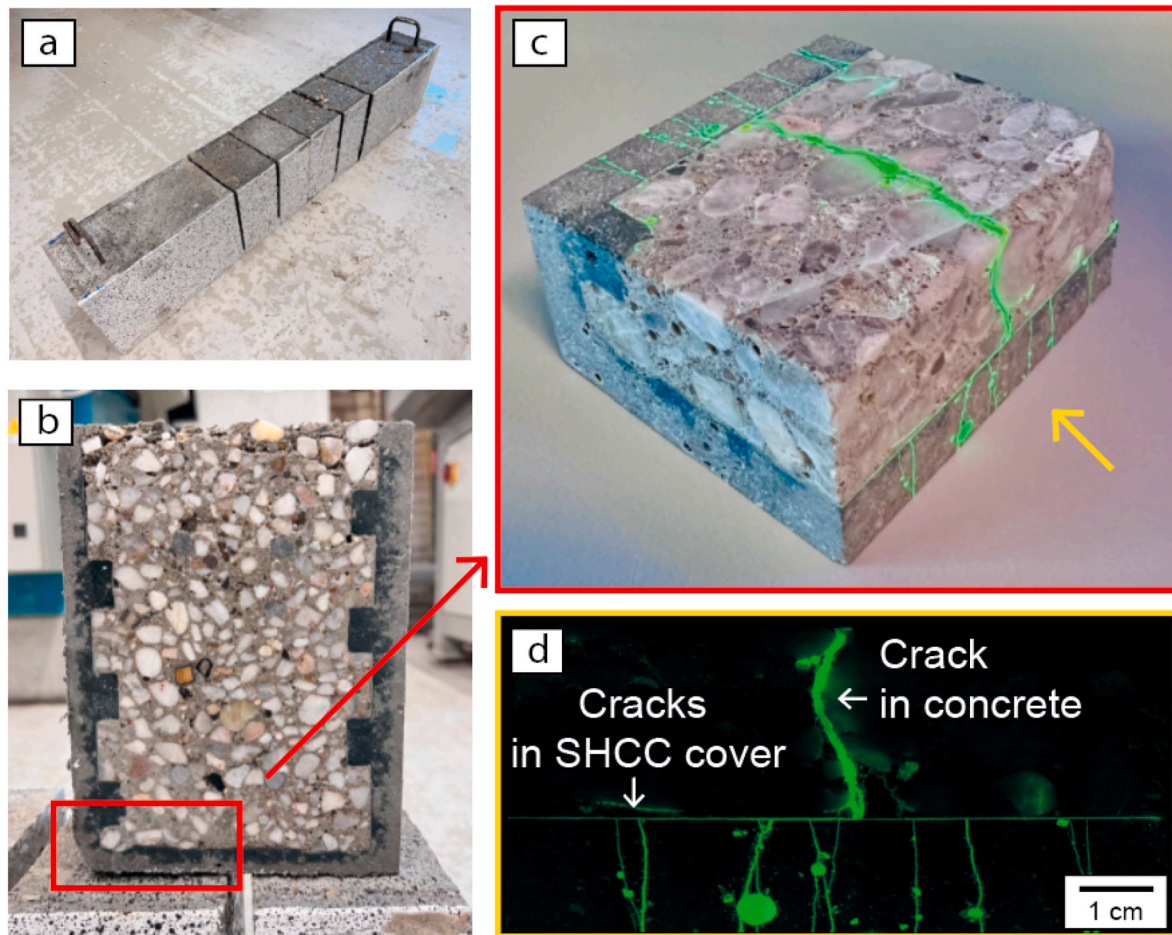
(a) Tested beams after sawing (beam length: 1 m), (b) cross-sectional image of a section demonstrating the covered system, (c) corner piece cut from the beam section after epoxy impregnation, (d) front surface of the corner specimen under UV light to highlight the crack path.
